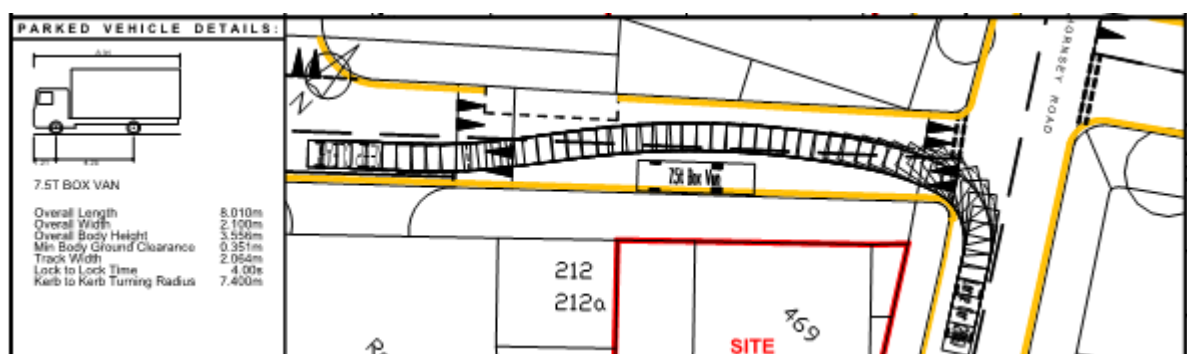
proposed servicing arrangement to 469 Hornsey Road from Fairbridge Road.
